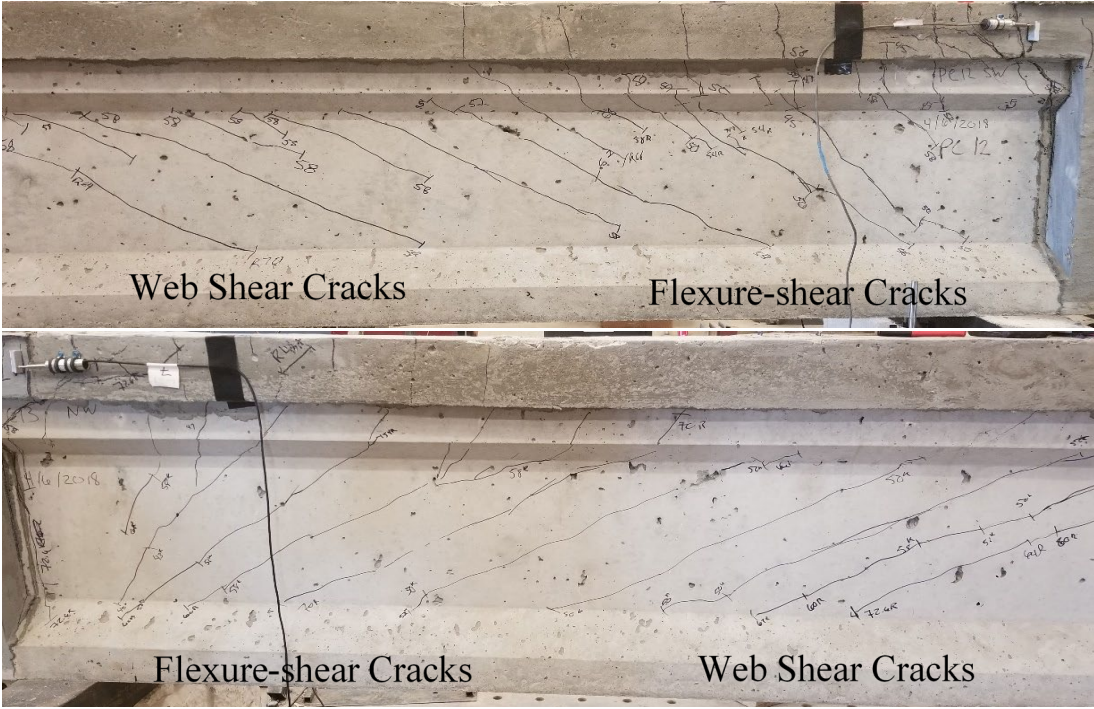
NC1-N girder with flexure-shear and web shear cracks (top) NC1-S girder with flexure-shear and web shear cracks (bottom)
